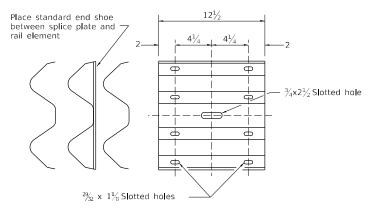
Plate A shall be placed between rail element and block-out at nonsplice mounting points only when steel block-outs are used.
